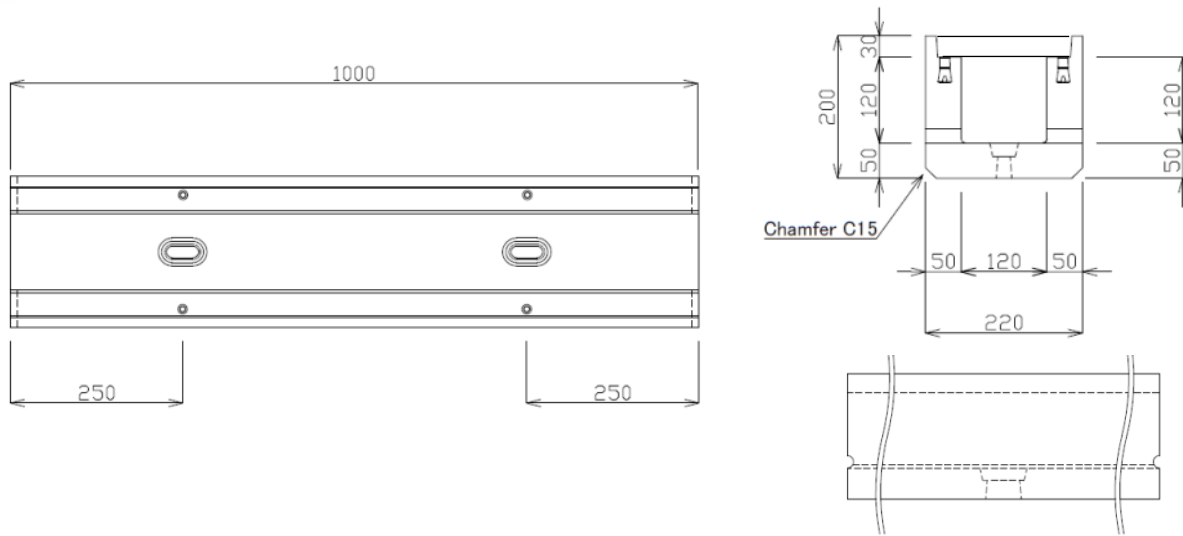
Shapes and dimension of Cable Duct for LCX at shaft 1
